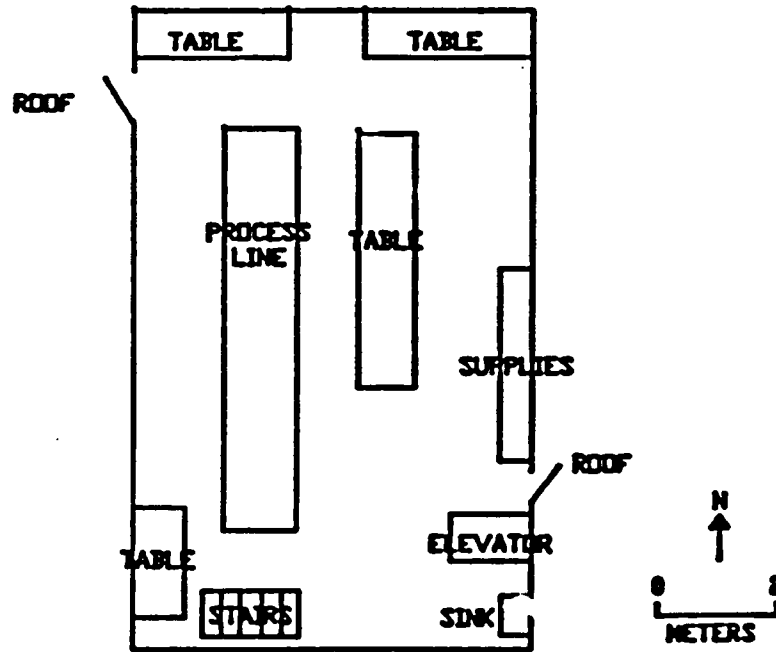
Floor Plan of the Sunflame Appliances Facility Penthouse.
